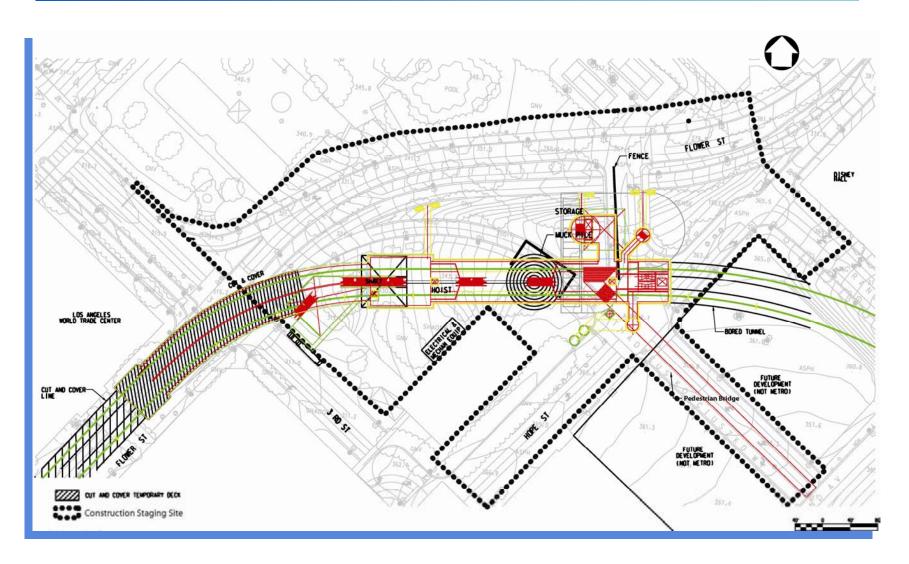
2<sup>nd</sup>/Hope Street Station (Underground Emphasis LRT Alternative and Fully Underground LRT Alternative)
